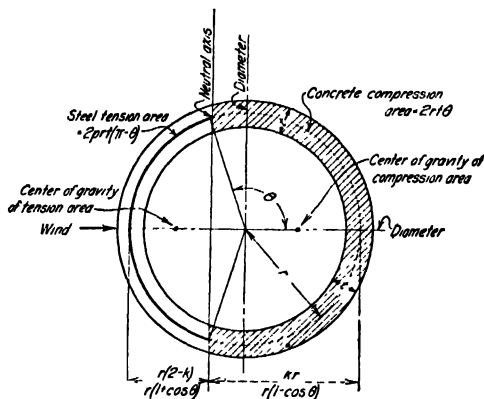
Compression and tension areas on a horizontal section of the shaft.
